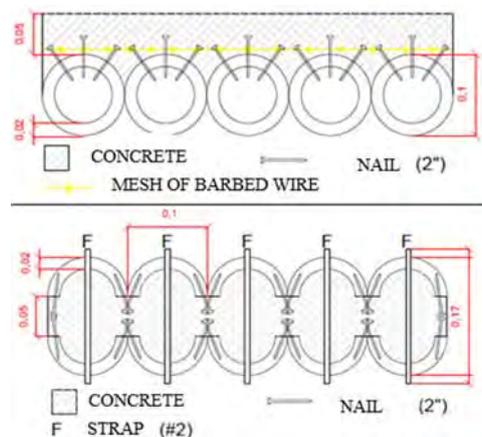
(a) Diagram of the cross-section of a mezzanine floor. (b) Diagram of the in-plant section of a partition wall
